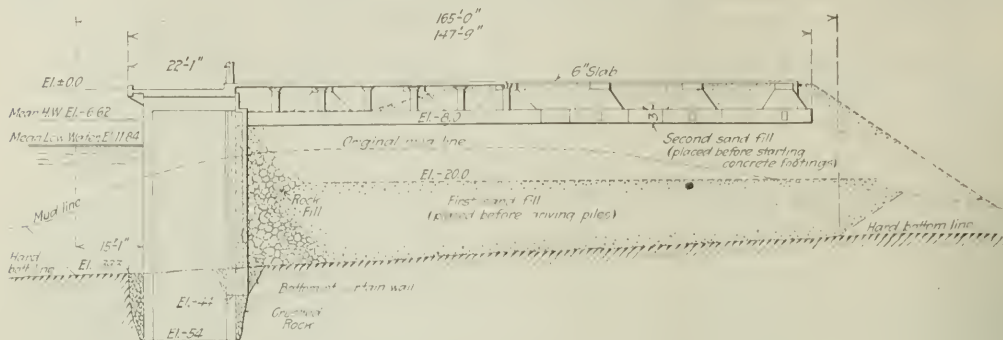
TYPICAL SECTION THROUGH SEAWALL AND FOUNDATION
